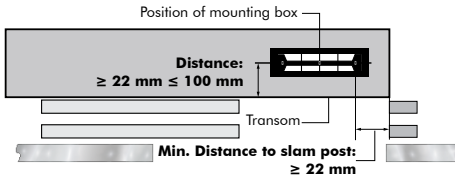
Position of the mounting box on the transom (left side-opening doors)
